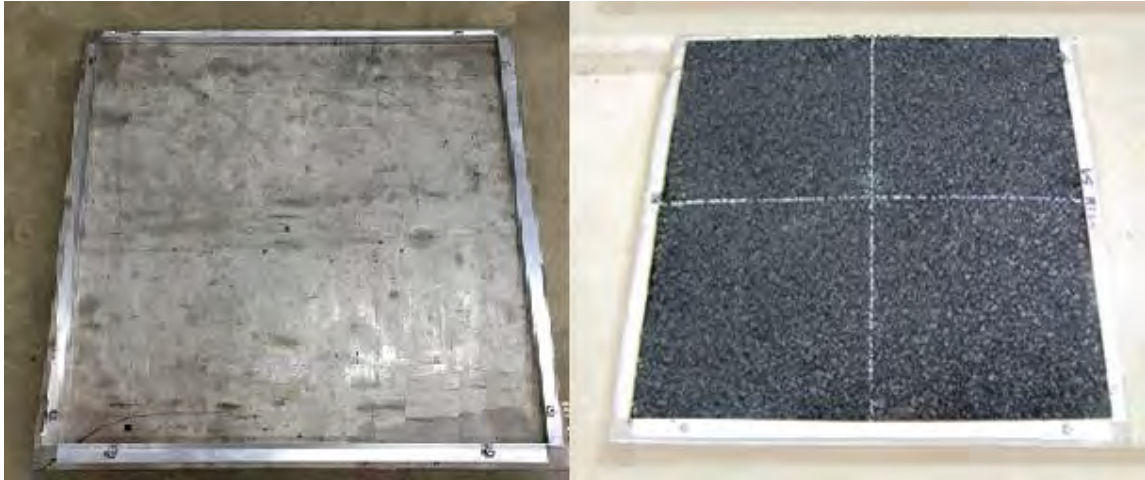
PTD Aluminum Mold and HMA Slab Specimen
